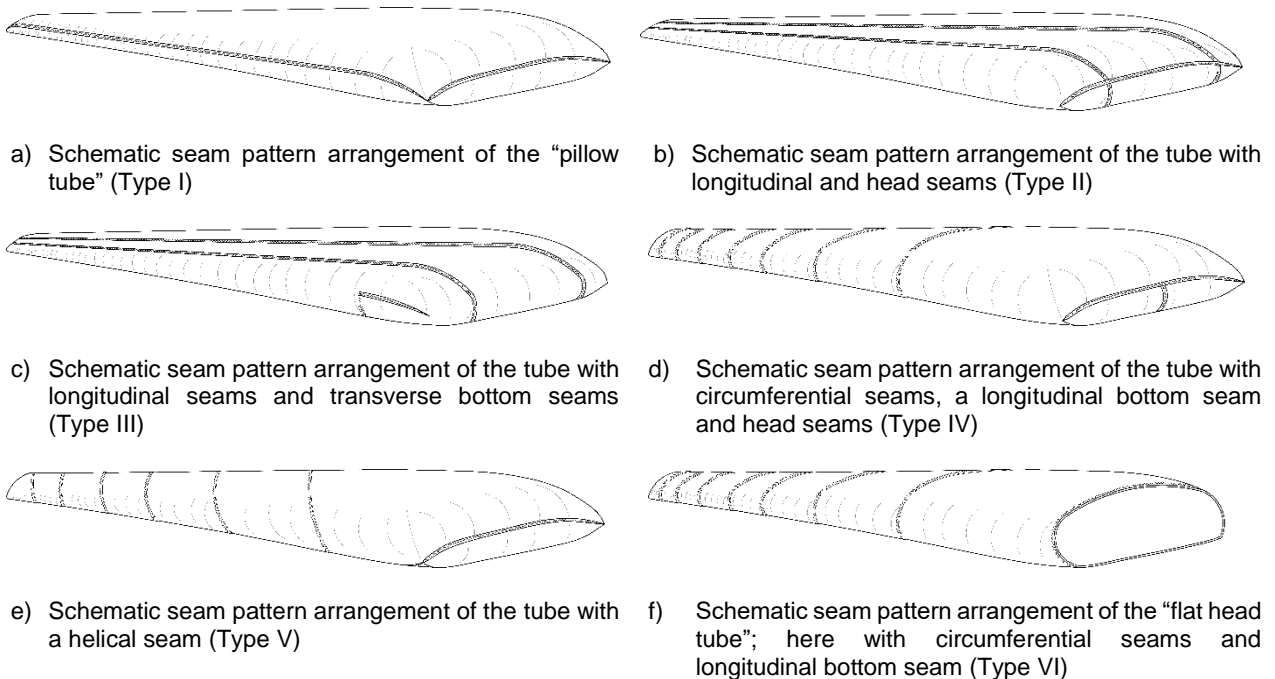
Schematic tube assembly illustrations showing the seam pattern
